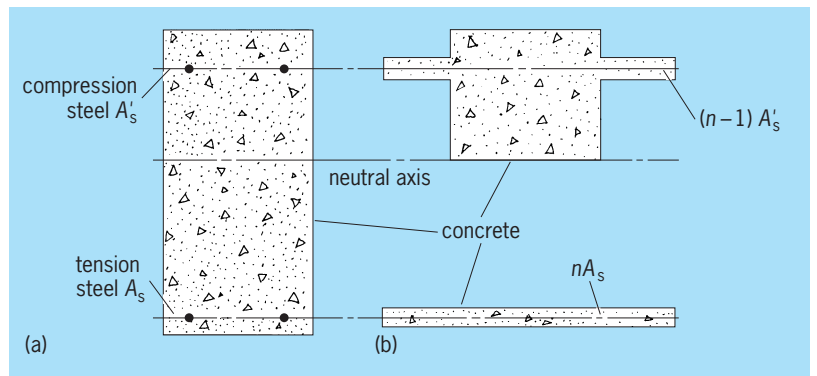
Sketch of concrete beam. (a) Actual beam section. (b) Same section transformed. The use of the term  $(n-1)A'_s$  prevents compression steel area from being included twice when computing moment of inertia of section;  $(n-1)A'_s = nA'_s - A'_s$ , because computations require the equivalent steel area to be added to the original concrete area above the neutral axis.
